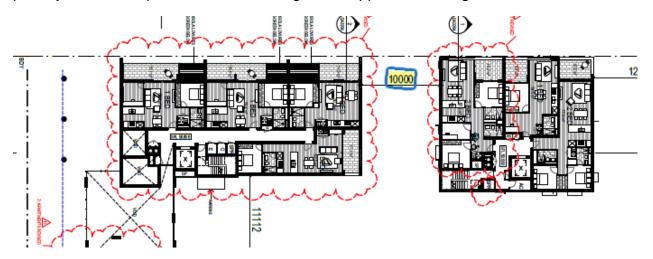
Diagram depicting separation between habitable rooms/balconies between Buildings 2 and 3 (see highlighted dimension)
